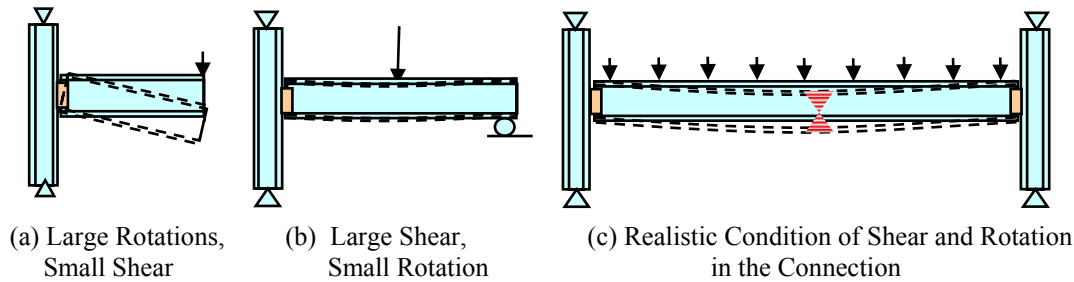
(a) Cantilever Test Specimen, (b) Elastic Beam Specimen, and (c) Realistic Specimen
